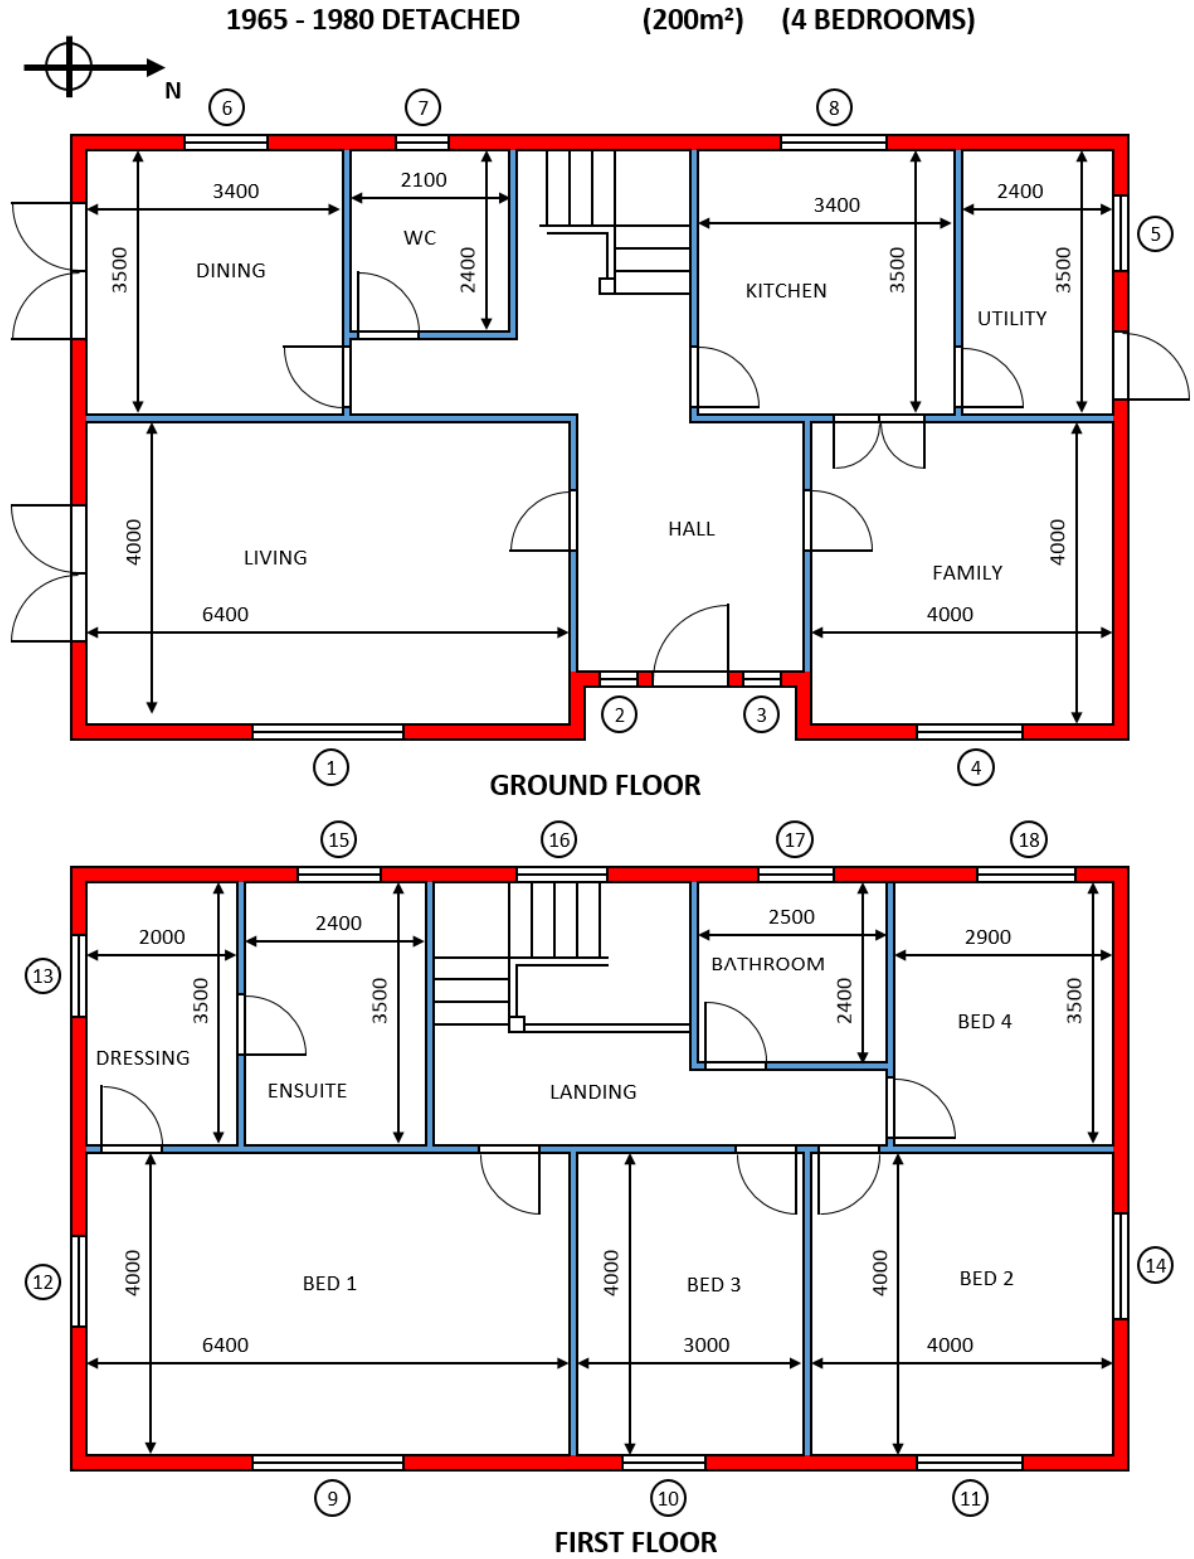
1965-1980 detached – building layout. Window references are numbers in circles; red walls are external and blue walls are internal.
